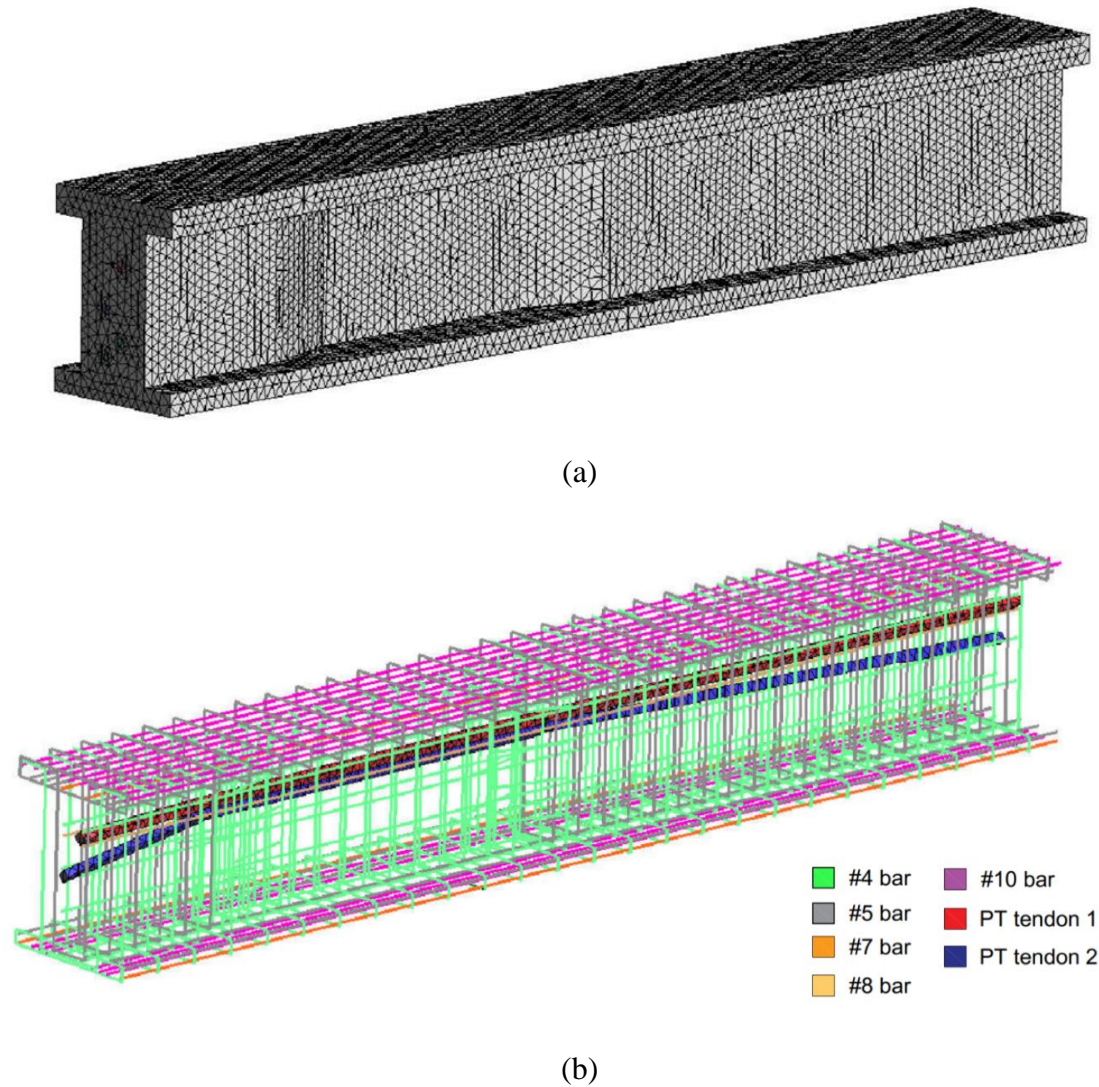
Discretization of: (a) post-tensioned girder specimen #2; and (b) reinforcing steel, including the post-tensioning ducts
